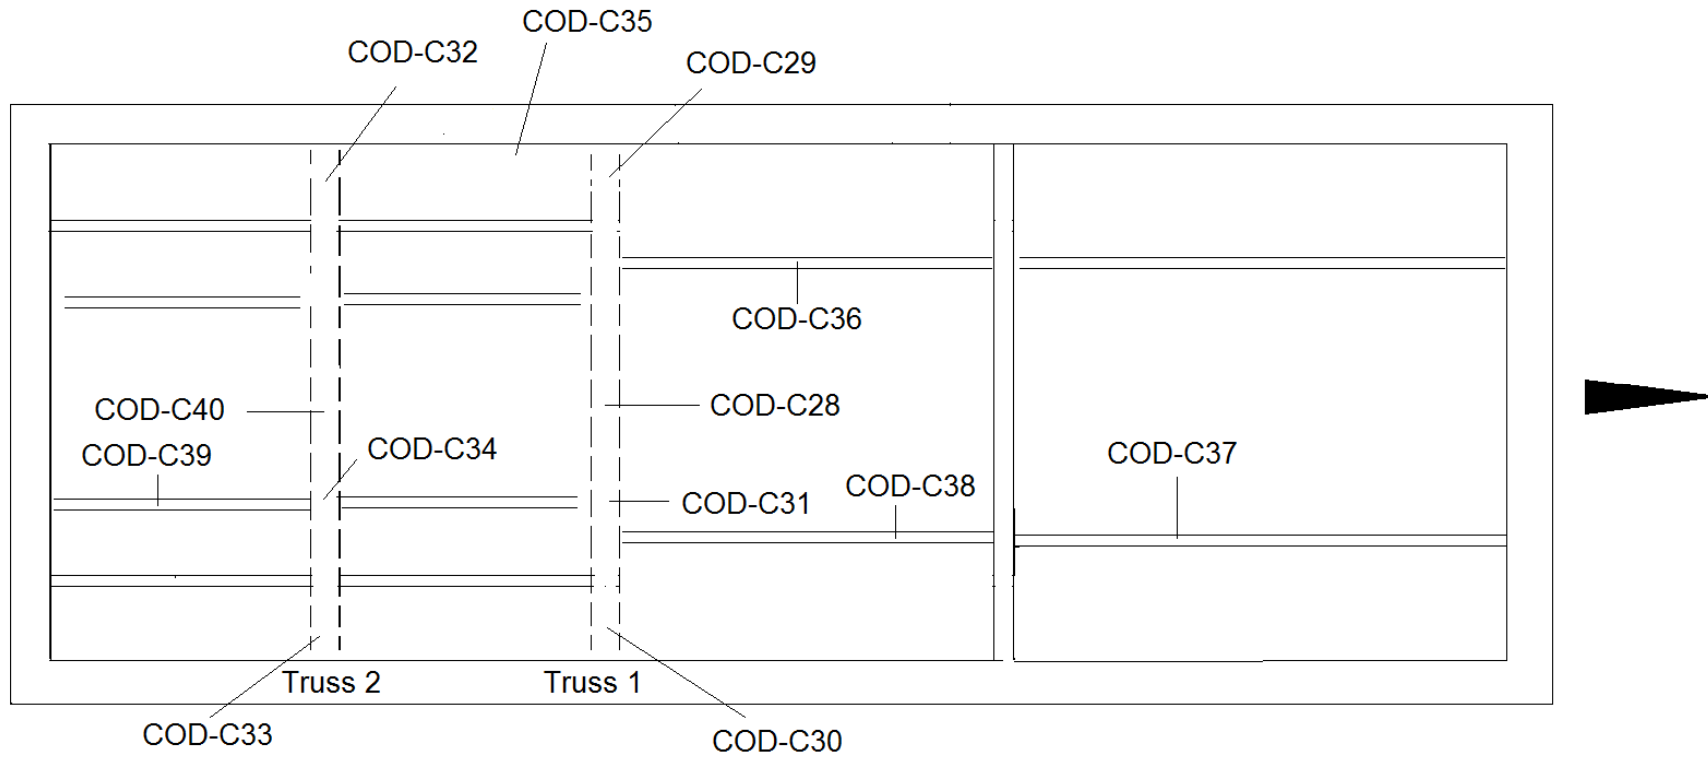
Sketch plan of the roof of the barn, showing the location of samples COD-C28–40
